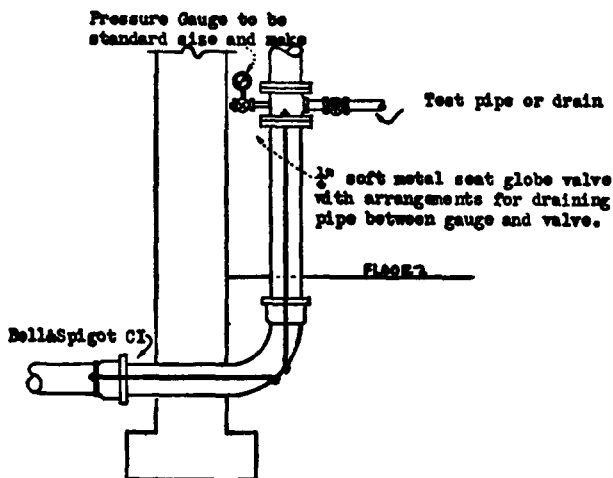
Test Pipe on Water Supply with Outside Control.
